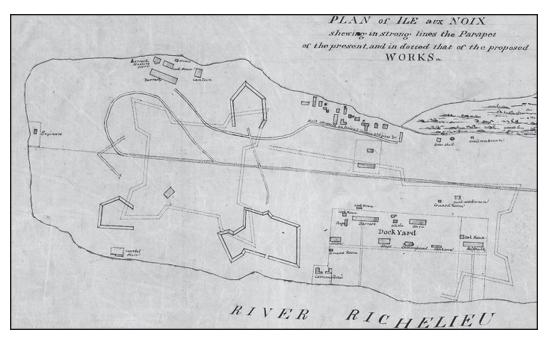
Detail of *PLAN of ILE aux NOIX showing in strong lines the Parapet of the present and in dotted that of the proposed WORKS ca. 1819,* known as the Romilly Plan (1819), showing a proposed plan for the construction of Fort Lennox.
